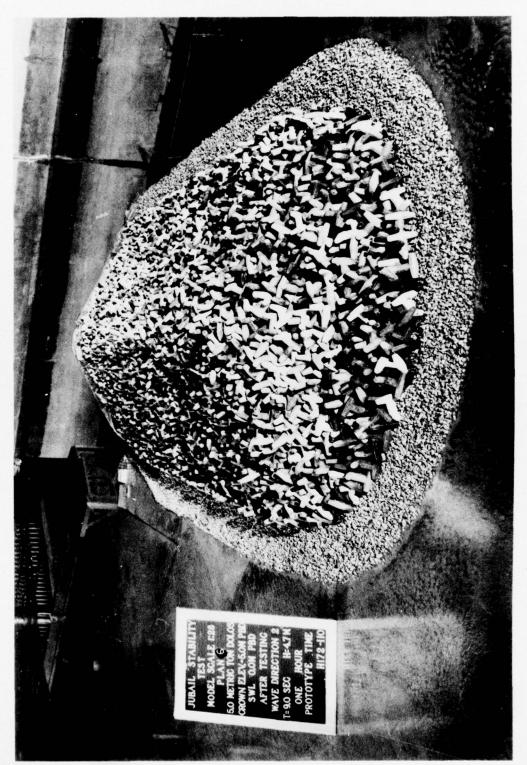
\,$  End view of Plan 6 after attack of 9-sec, 4.7-m waves from wave direction 2
